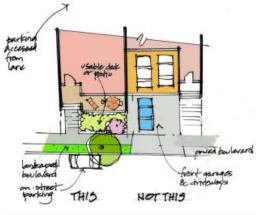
Garages are ideally located in the back of the house to front active uses on the street.
